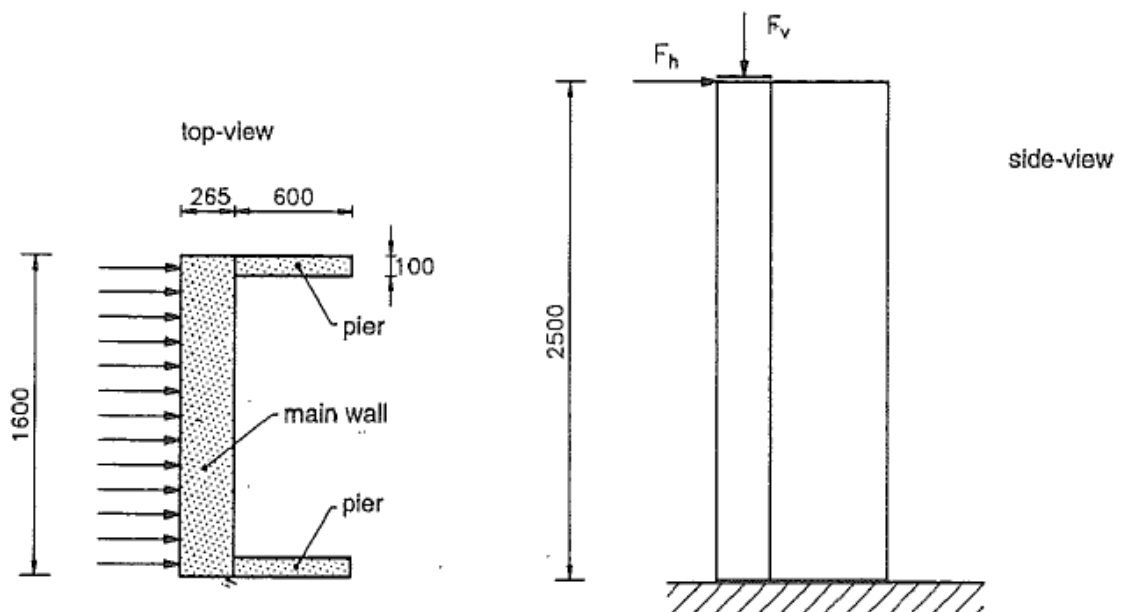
Test set-up of the experimental research on wall-pier connection by Raijmakers and Van der Pluijm (Rots 1997)
